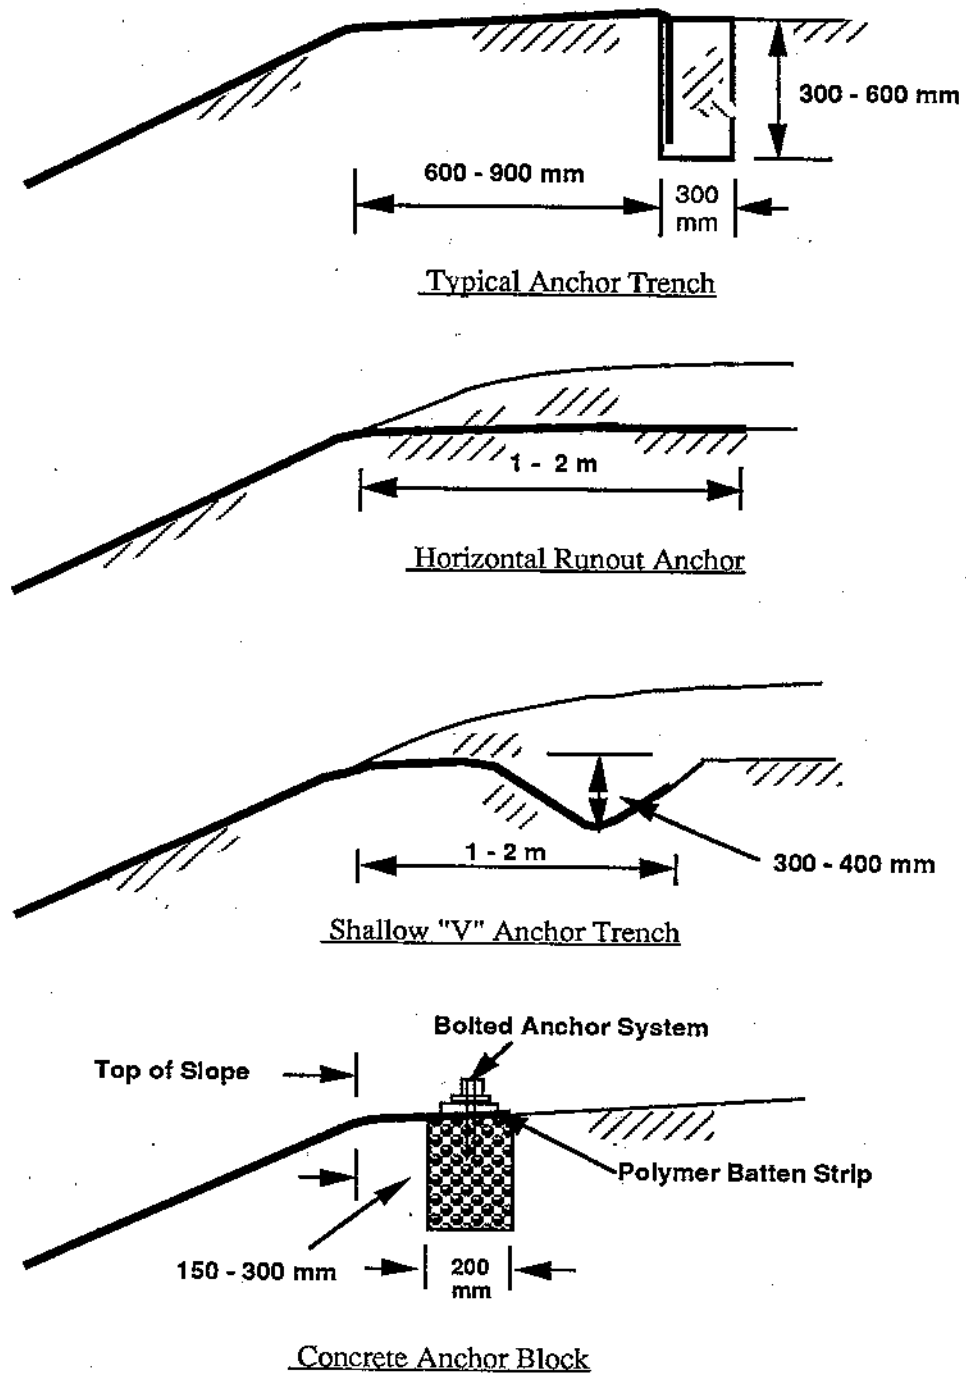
Various Types of Geomembrane Anchors Trenches (Dimensions are Typical and for Example Only).
